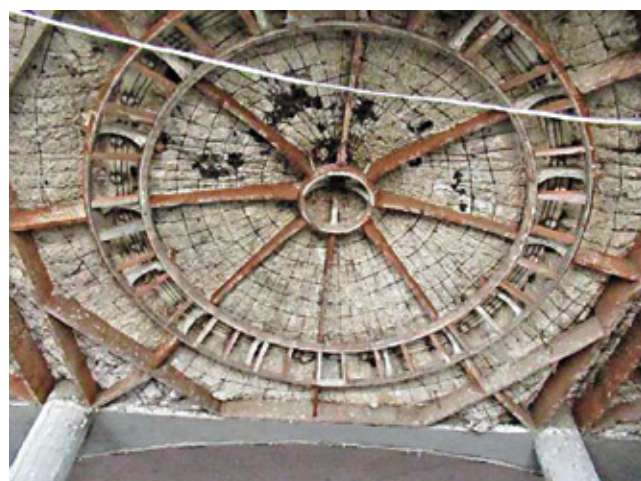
The general view of the dome on a wooden frame located on the first floor
